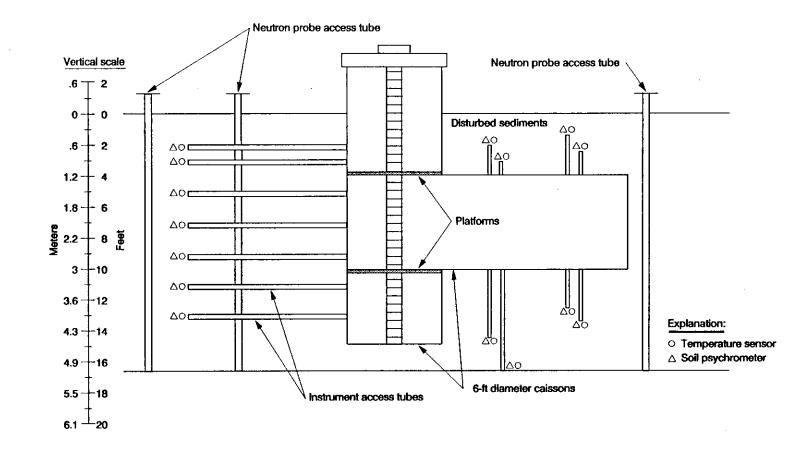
Installation details of the west test trench (Laney et al., 1988).
